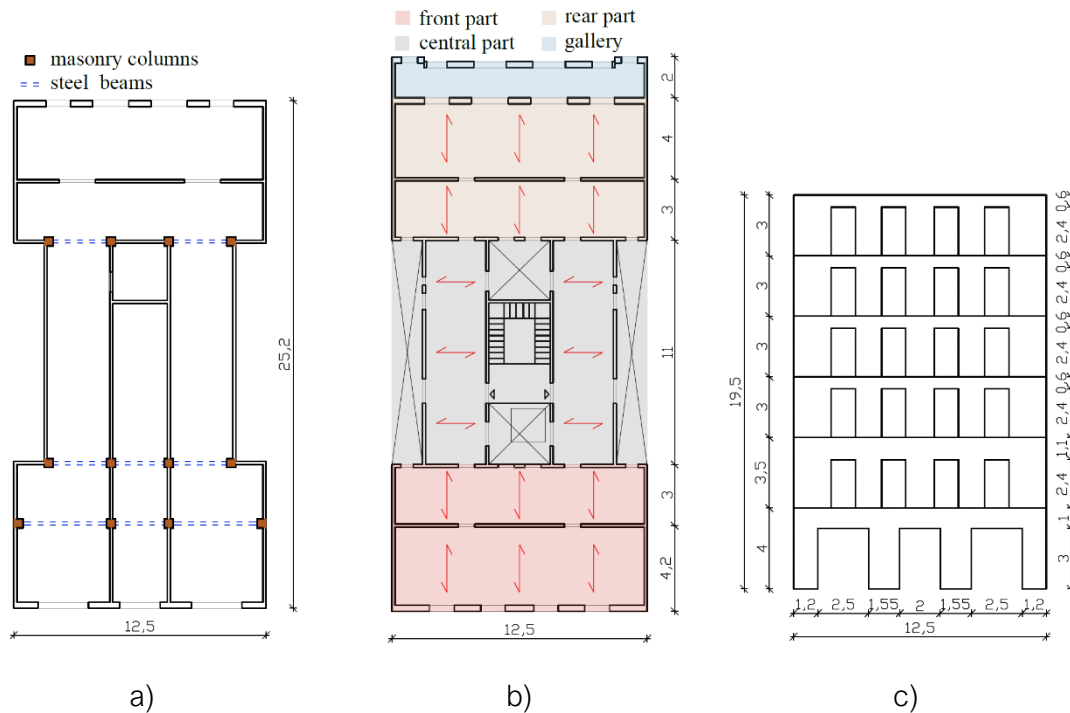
Selected reference building of the Eixample district: a) ground floor configuration; b) floor plan section (adapted from Cornadó Bardón 2015); c) front façade geometry (dimensions in metres).
